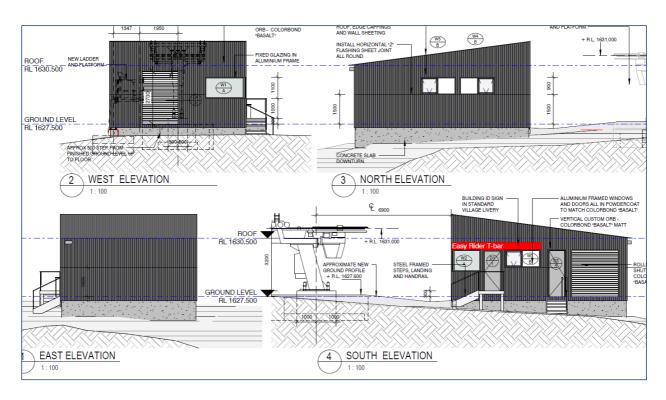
| Proposed new bottom station building elevations (Source: Applicant's documentation)
